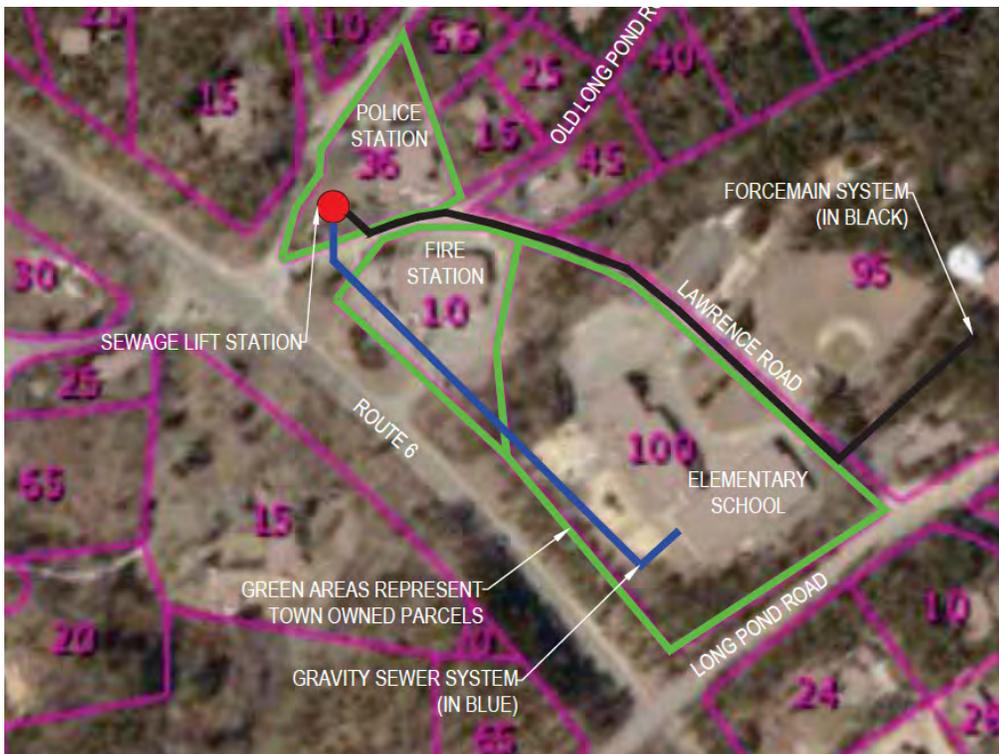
B - 95 Lawrence Road project – Municipal Buildings Wastewater Sewershed B
